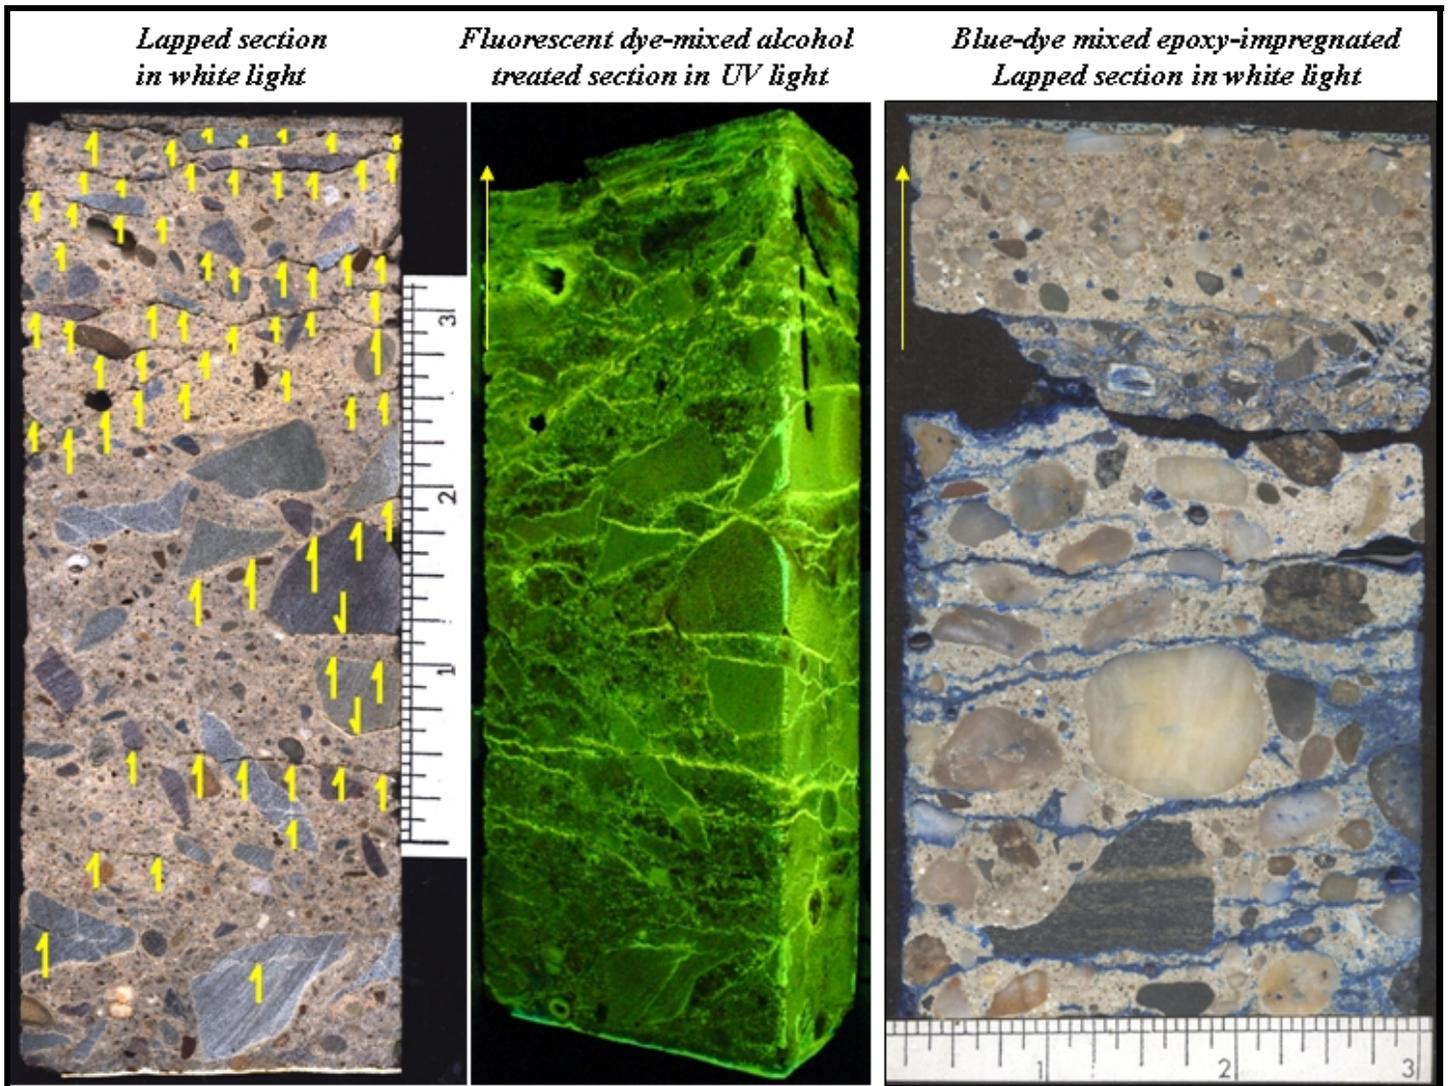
Delamination due to cyclic freezing and thawing of outdoor concrete slabs at critically water-saturated conditions. The left and middle photos are of the same cross-section of a core from a bridge deck shown in different modes of sample preparation. The right photo shows cross-section of a core from a parking garage, where severe cracking throughout the depth of the concrete substrate has apparently failed the repair mortar coat at the top.
